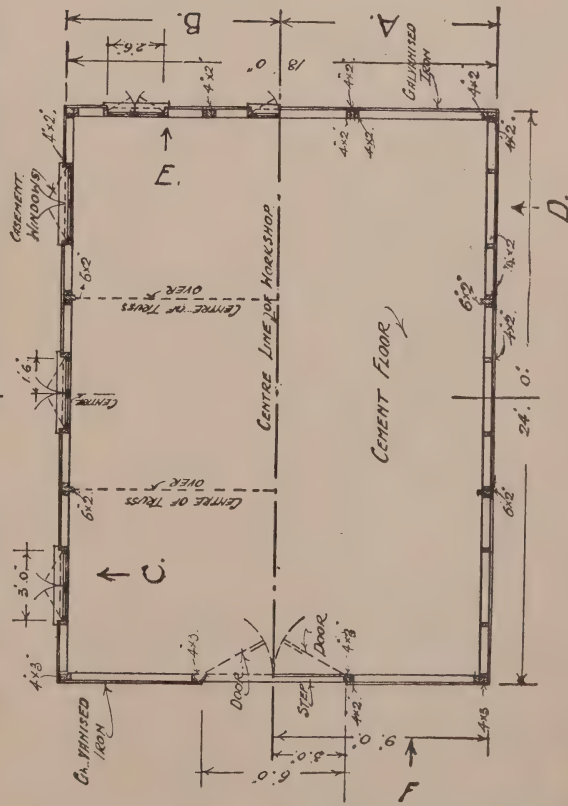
Half Plans of Floor and Windows through Windows of Portable Workshop
